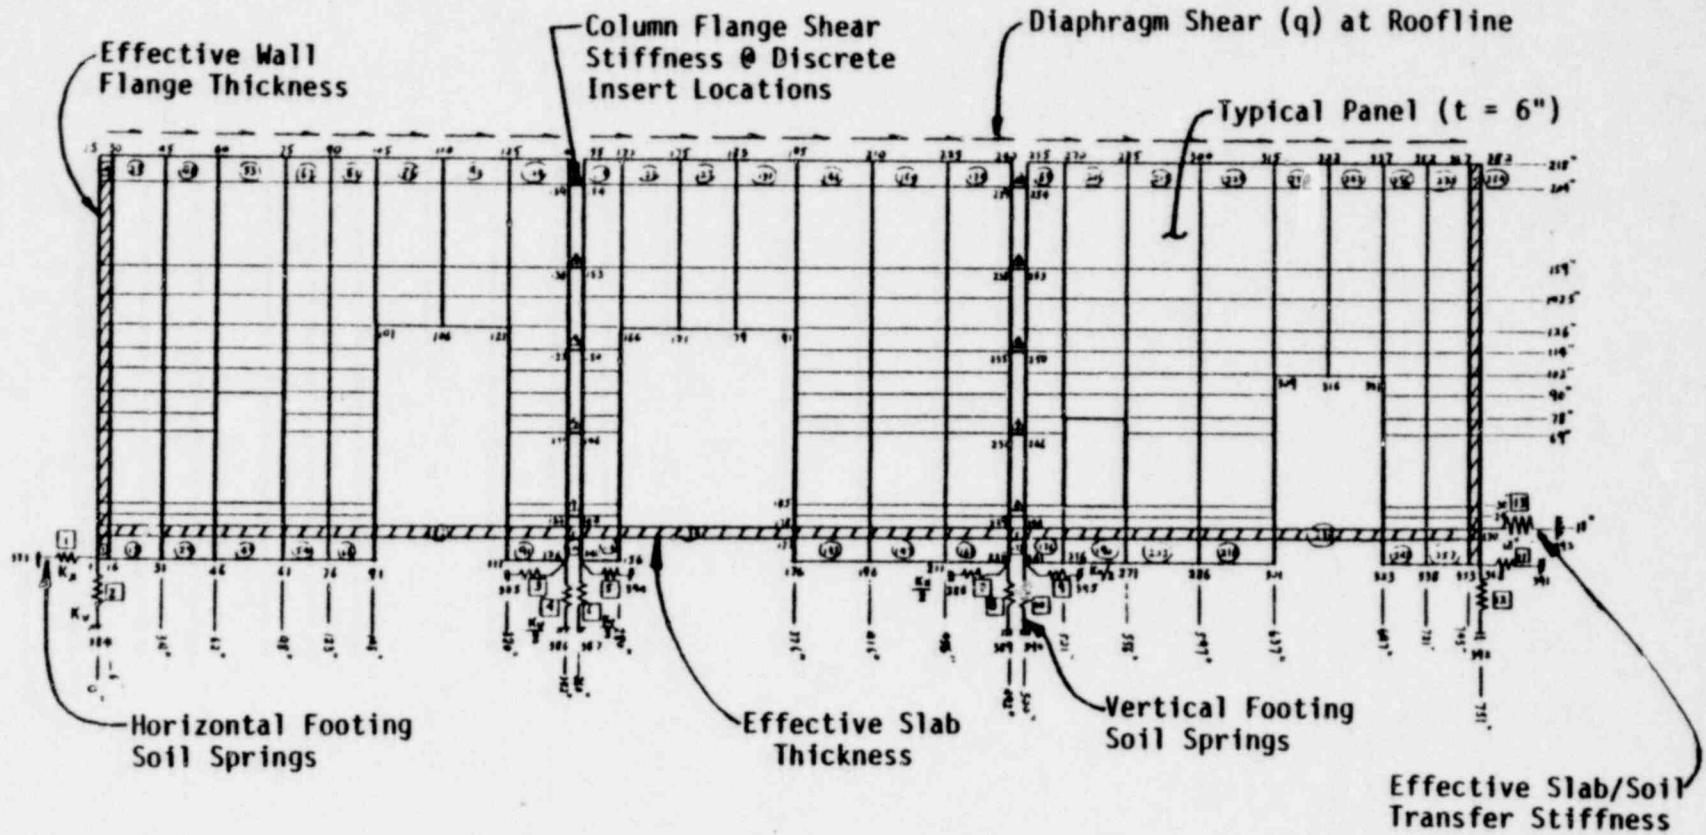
FINITE ELEMENT MODEL OF SOUTH WALL
